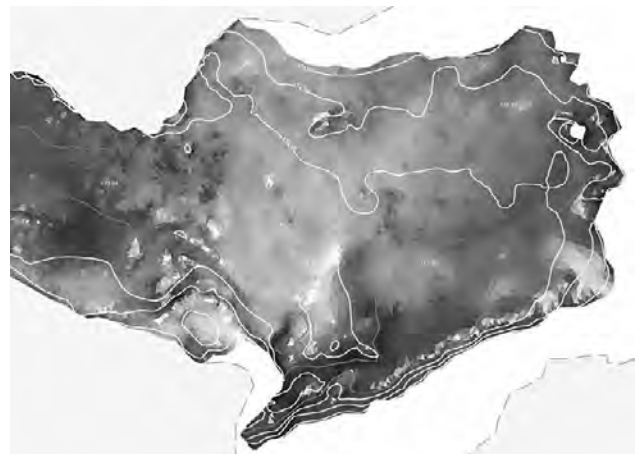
Plan with elevation levels and contour lines of the Gothic Hall.
